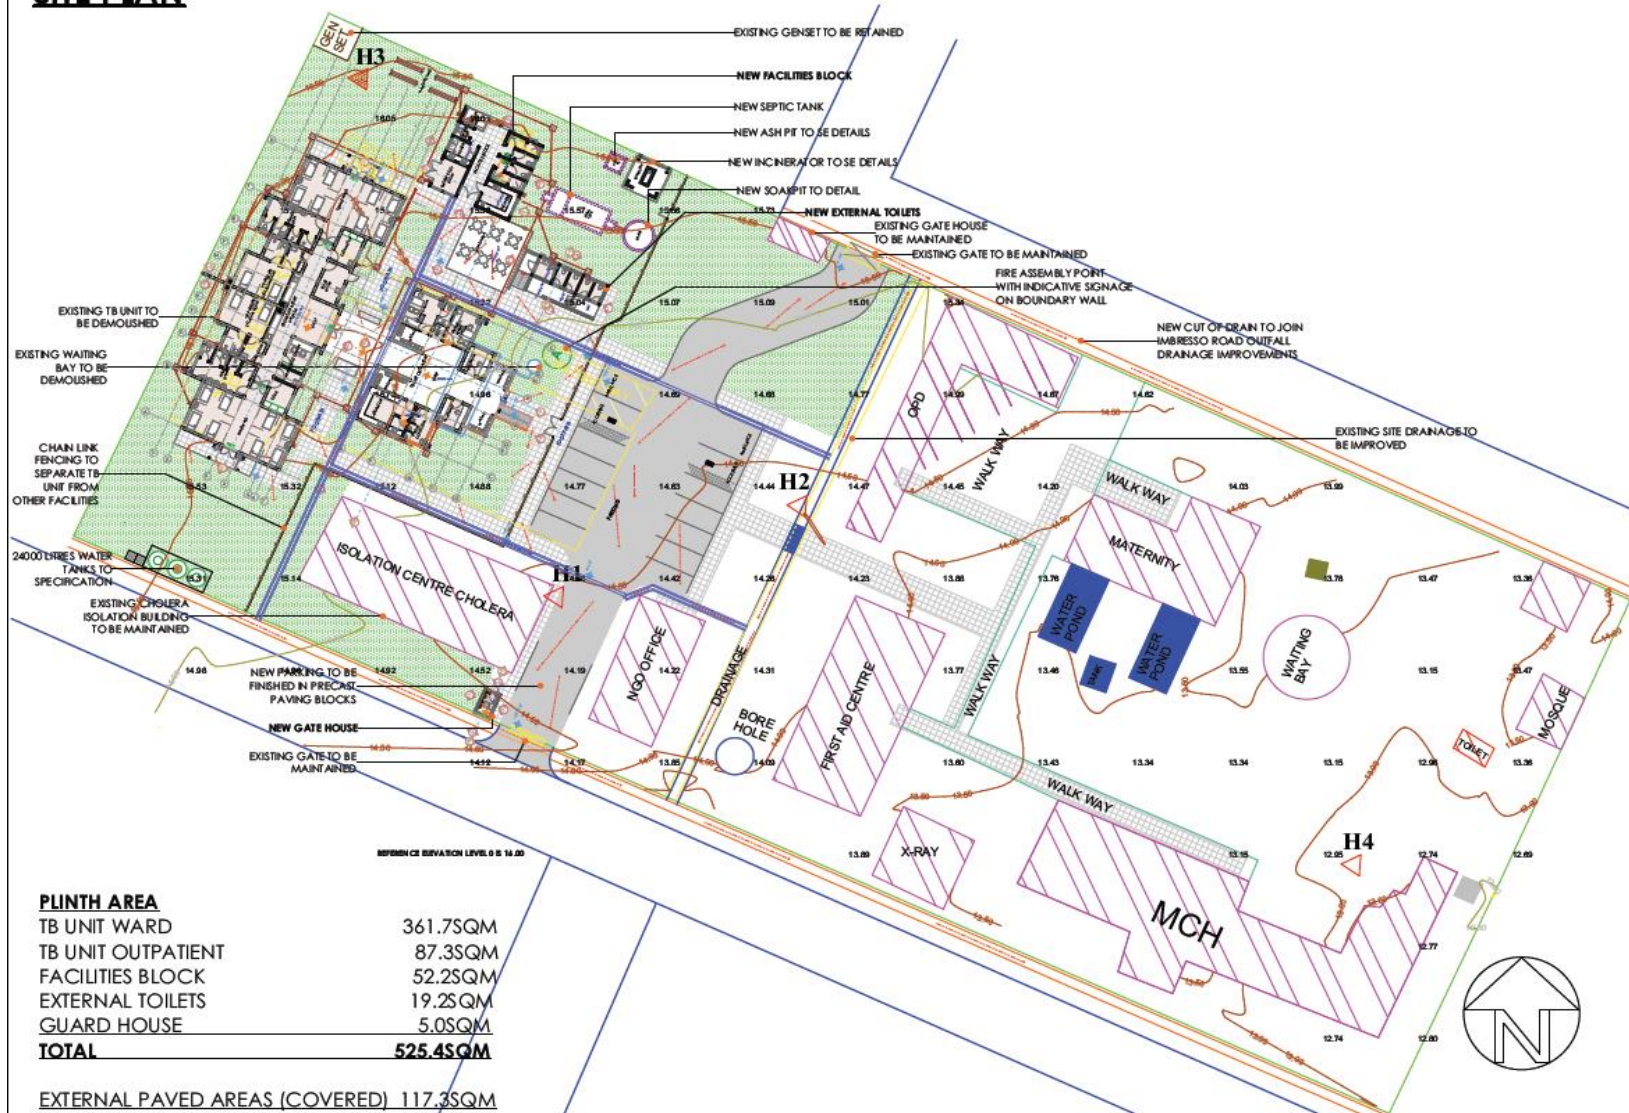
The proposed site plan for the reconstruction of TB Unit
